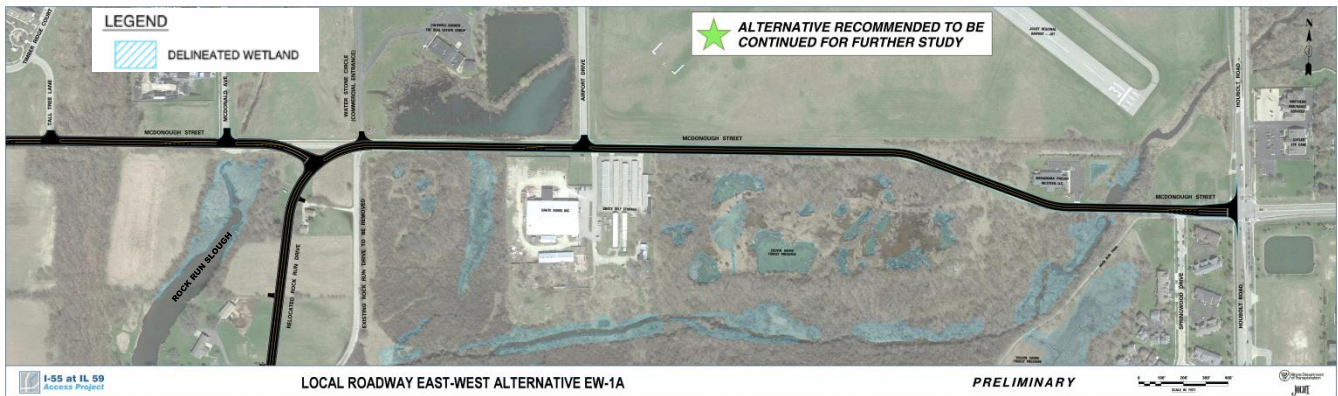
East-West Connector Alternative EW-1A Concept Plan
